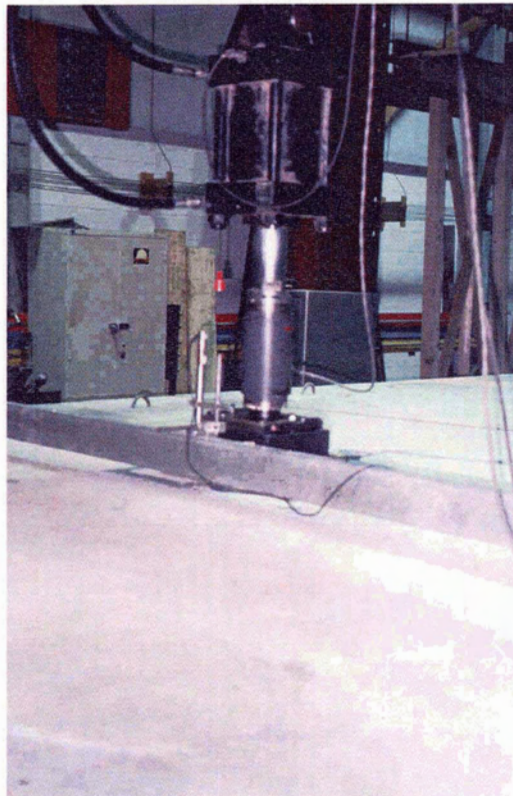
Hydraulic Piston providing Pulsating Load. LVDT Mounted to Straight Edge in Foreground.
